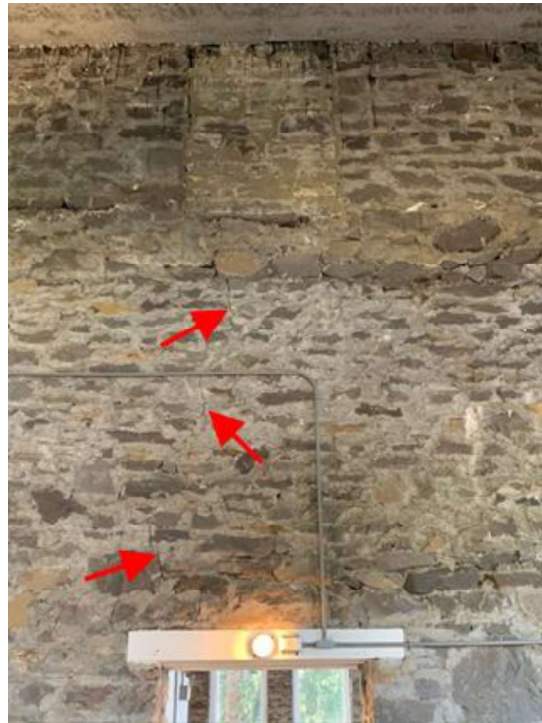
Cracking of Interior Stone Masonry Wall Above Door Opening
